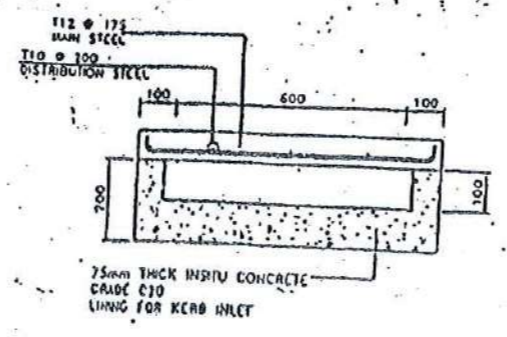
LONG PRE CAST CONCRETE KERB SECTIONS
